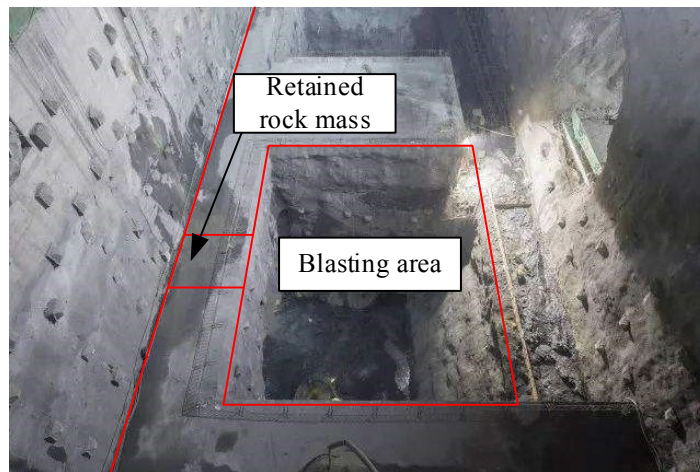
The floor blasting area of underground powerhouse of Baihetan Hydropower Station
